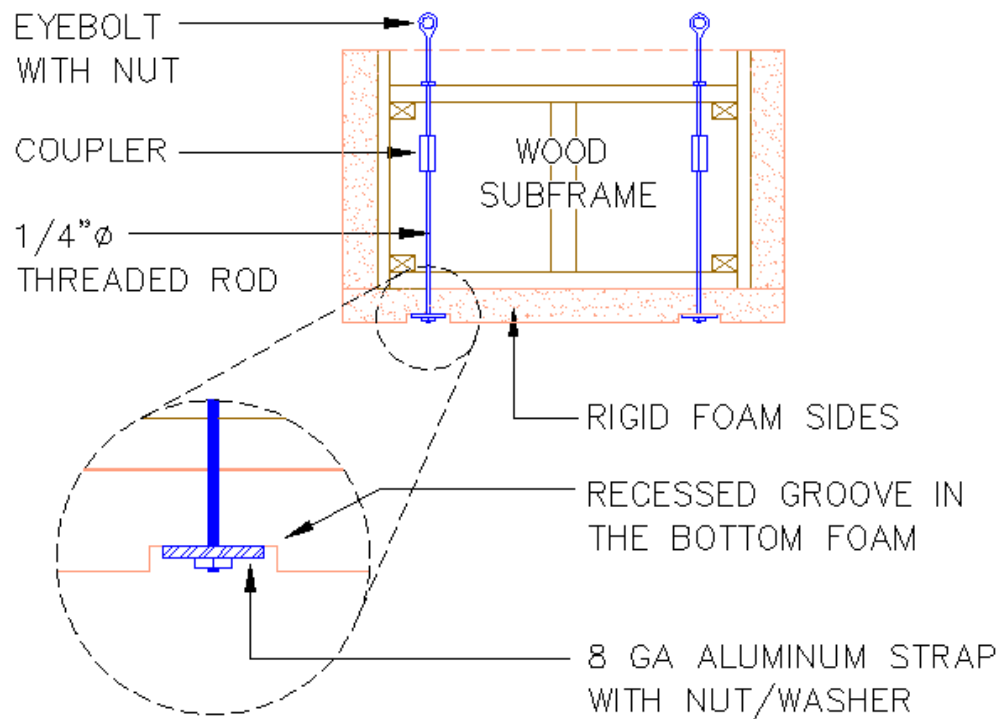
Section of Model Subframe with Aluminum Straps and Eyebolt Rod Assembly
